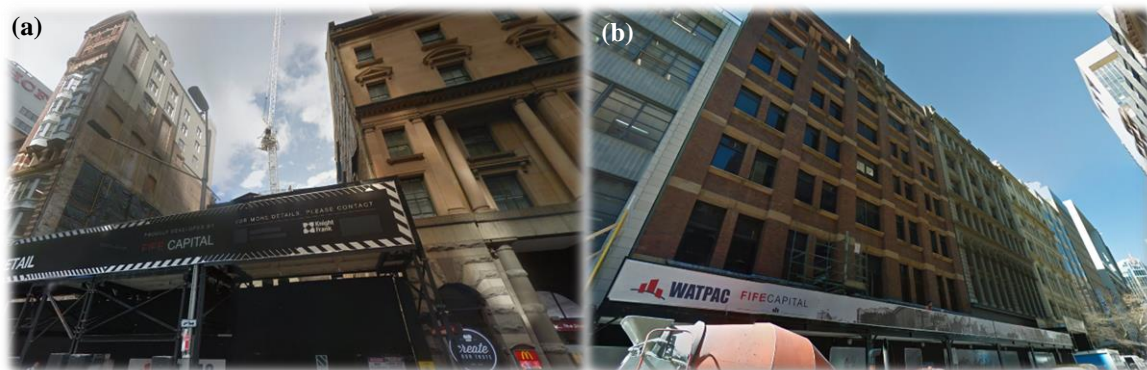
View of heritage listed buildings: (a) on George Street - to the north and south of the site - after demolition (b) within the development site on York Street.
